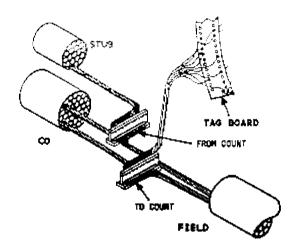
Place Half-Tap Module on 25 Pair of Stub Cable
